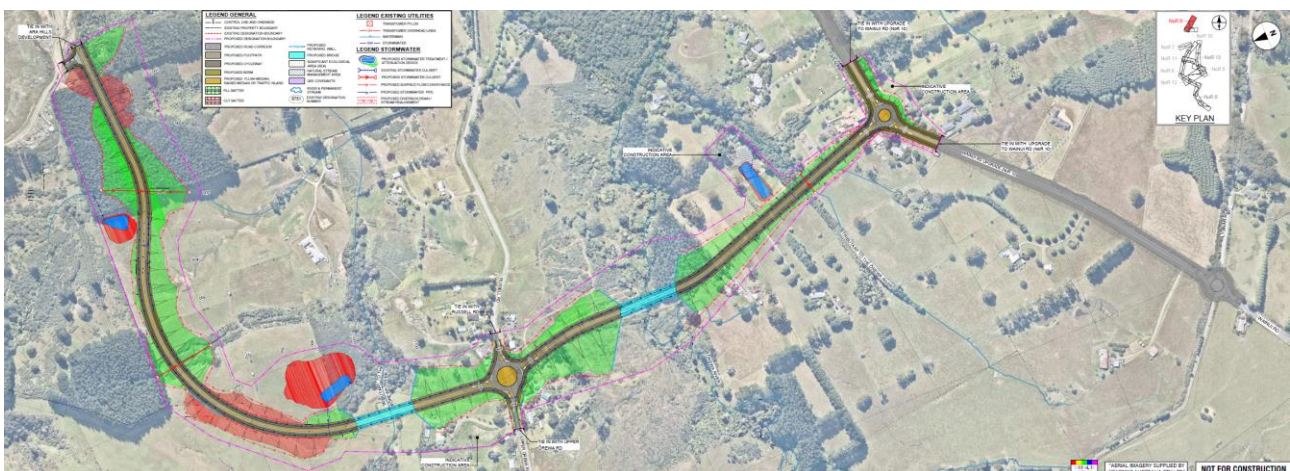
NoR 6 location and extent (sourced from the General Arrangement Plan)
